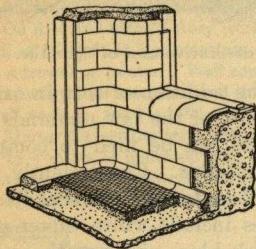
Rectangular glazed wall tile, round ceramic-mosaic floor tile, separate cove and "woven" combination tile at internal angle and at window.
